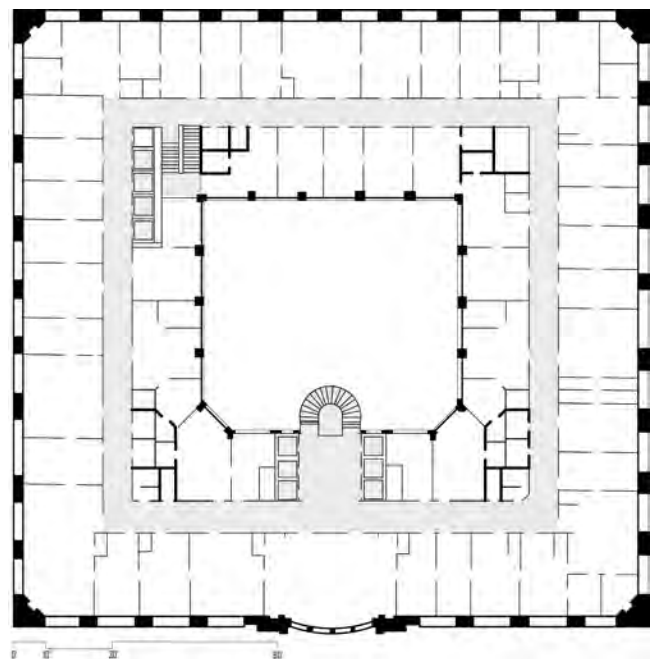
Typical floor plan, *The Rookery* (1885–1888), Chicago, Burnham & Root
